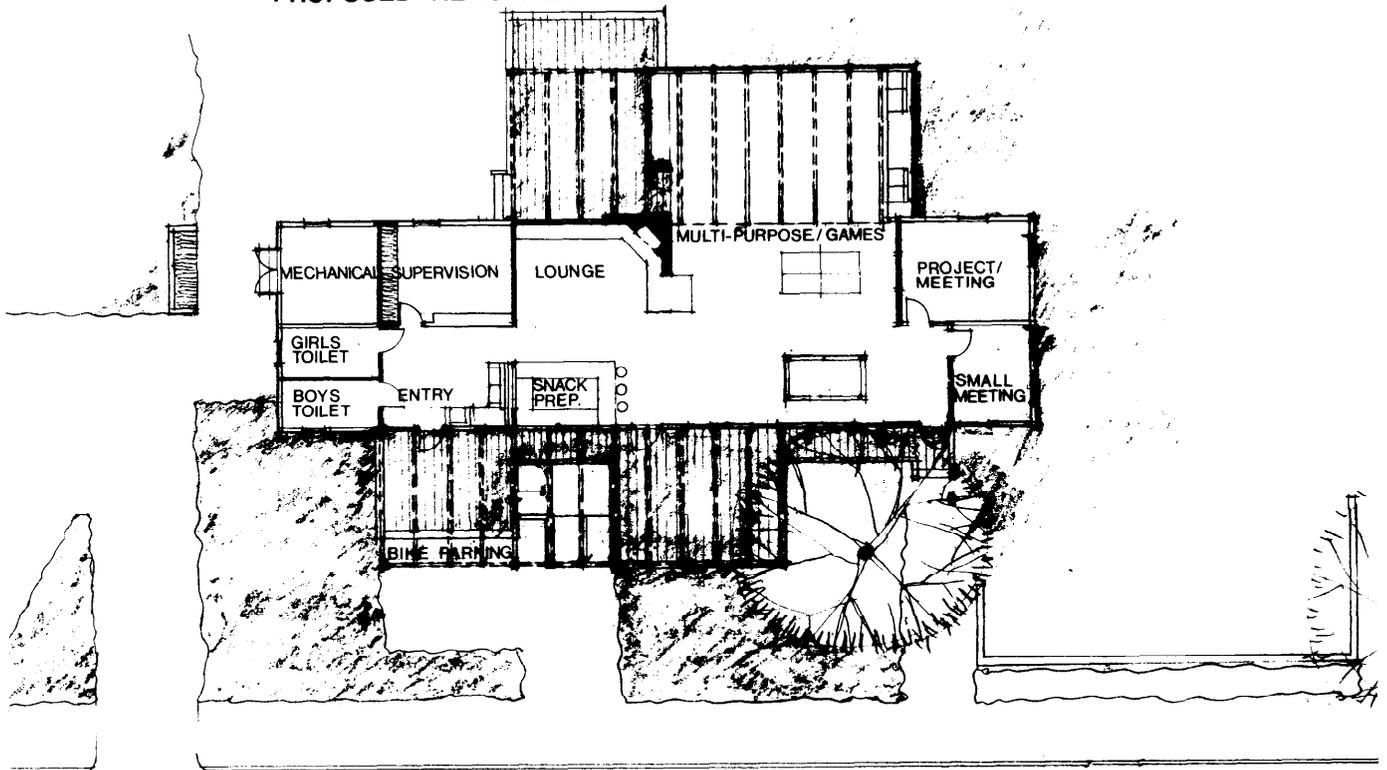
Renovated Small Neighborhood DYAC: Floor Plan
